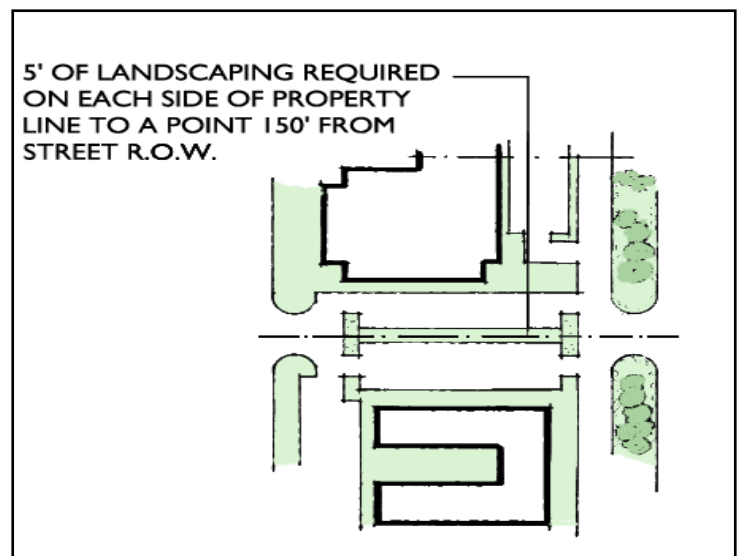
Plan Depicting 'Ganged Entry' concept
